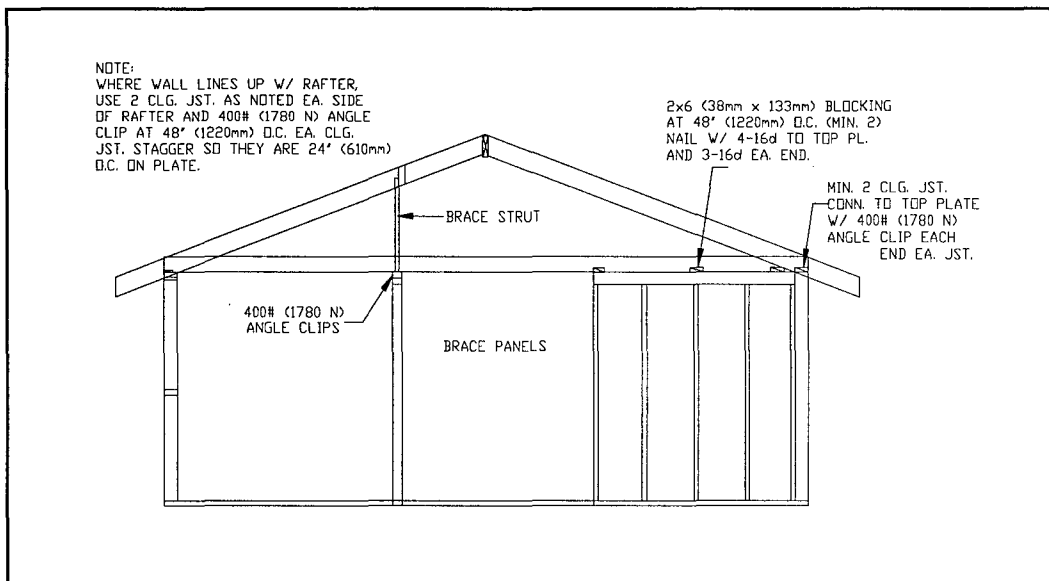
Wall parallel to truss bracing detail.
